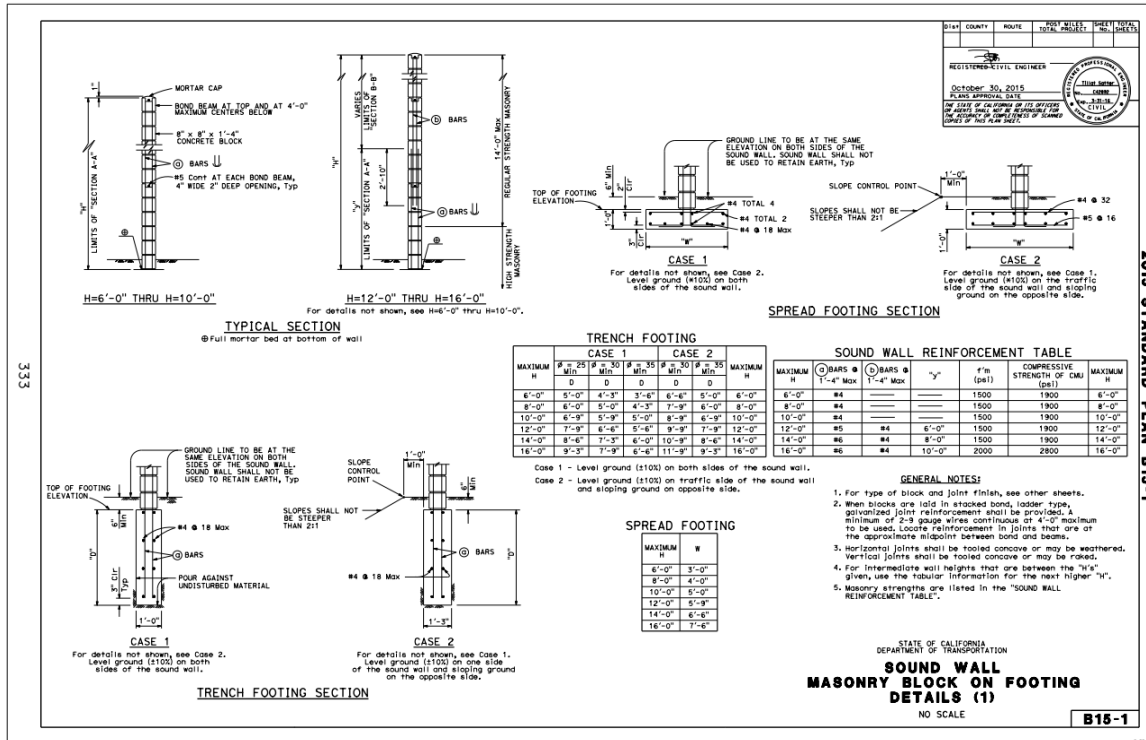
Standard Plan B15-1 for Sound Wall Masonry Block on Footing Detail [5].
